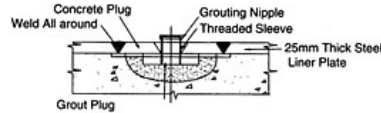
Details of concreting/grouting Plug in liner plate fitted with the grouting nipple.
